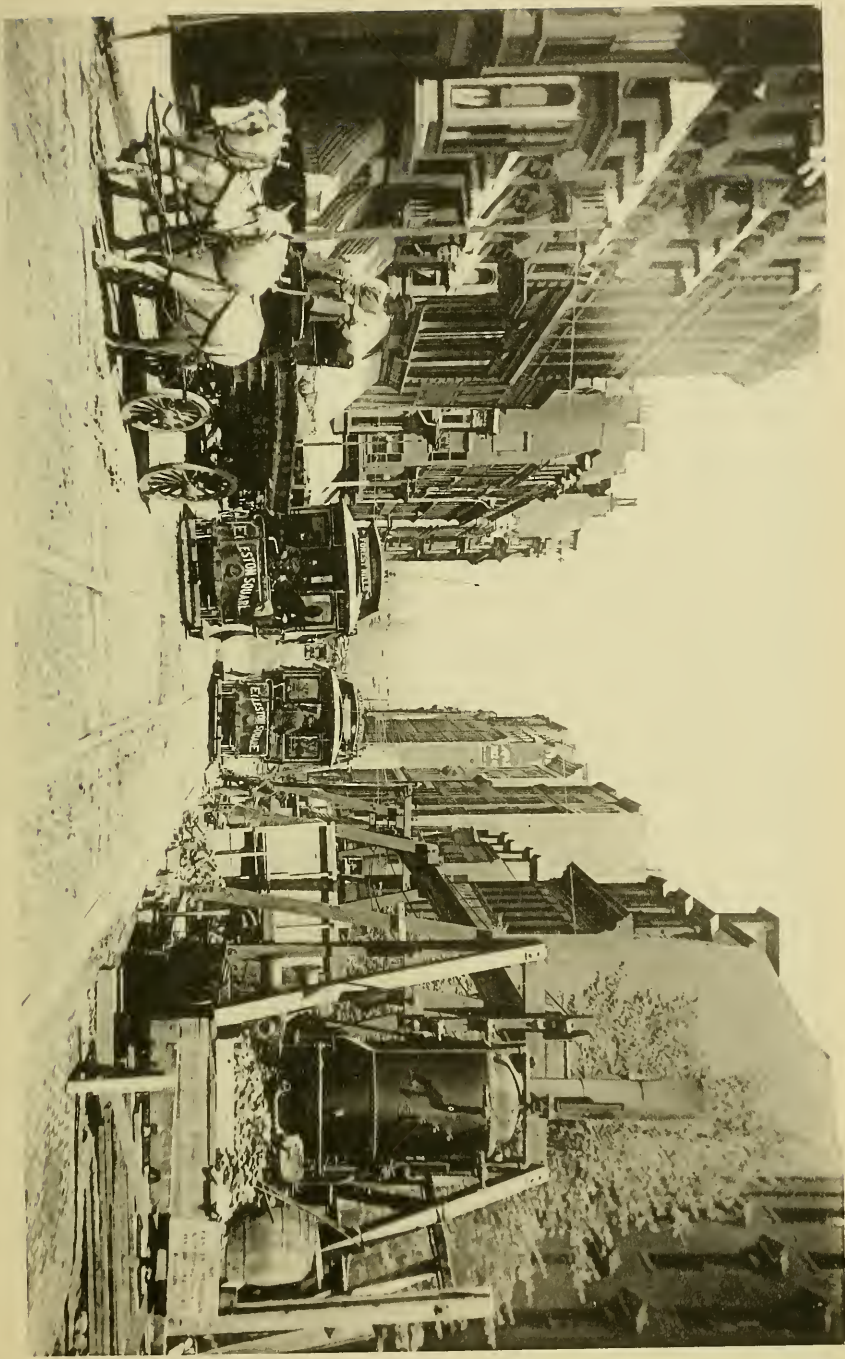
VIEW ON TREMONT STREET, DURING CONSTRUCTION OF SECTION 4. BRIDGES CAN BE SEEN BEYOND CROSS-WALK. May 8, 1896.
